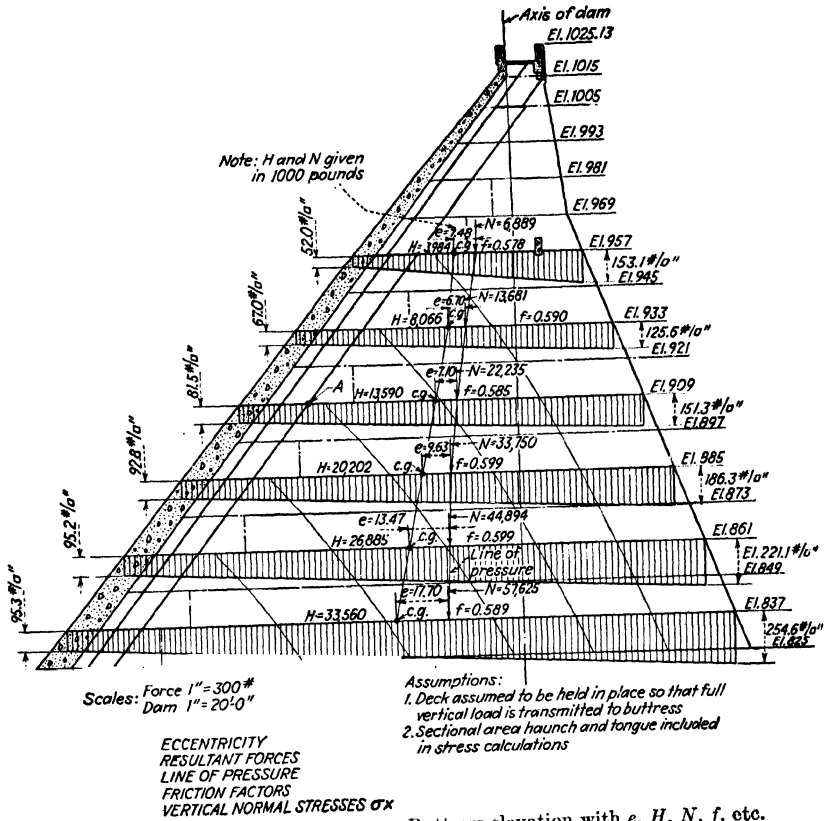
Possum Kingdom Dam. Buttress elevation with e , H , N , f , etc.
